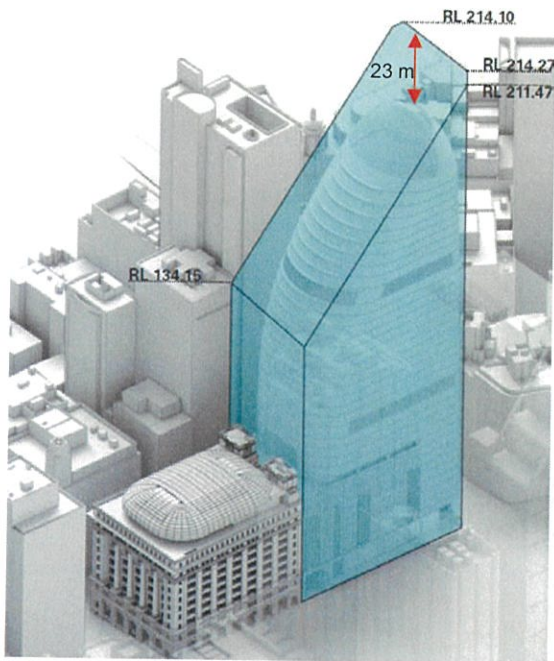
| 3D modelling of proposal sitting within the approved building envelope in green (Source: Applicant's RtS)
